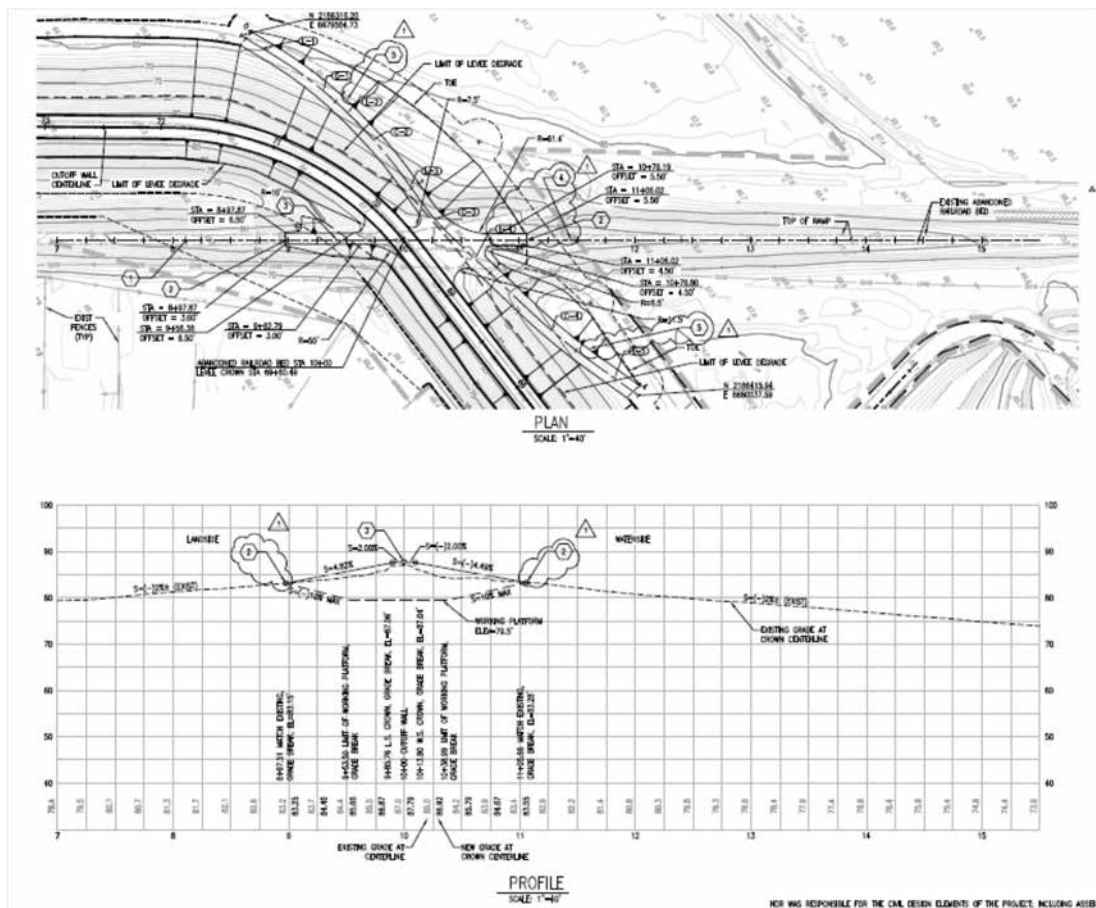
Examples of plan and section survey for Marysville Levee, CA, USA (courtesy USACE, Wielputz)
